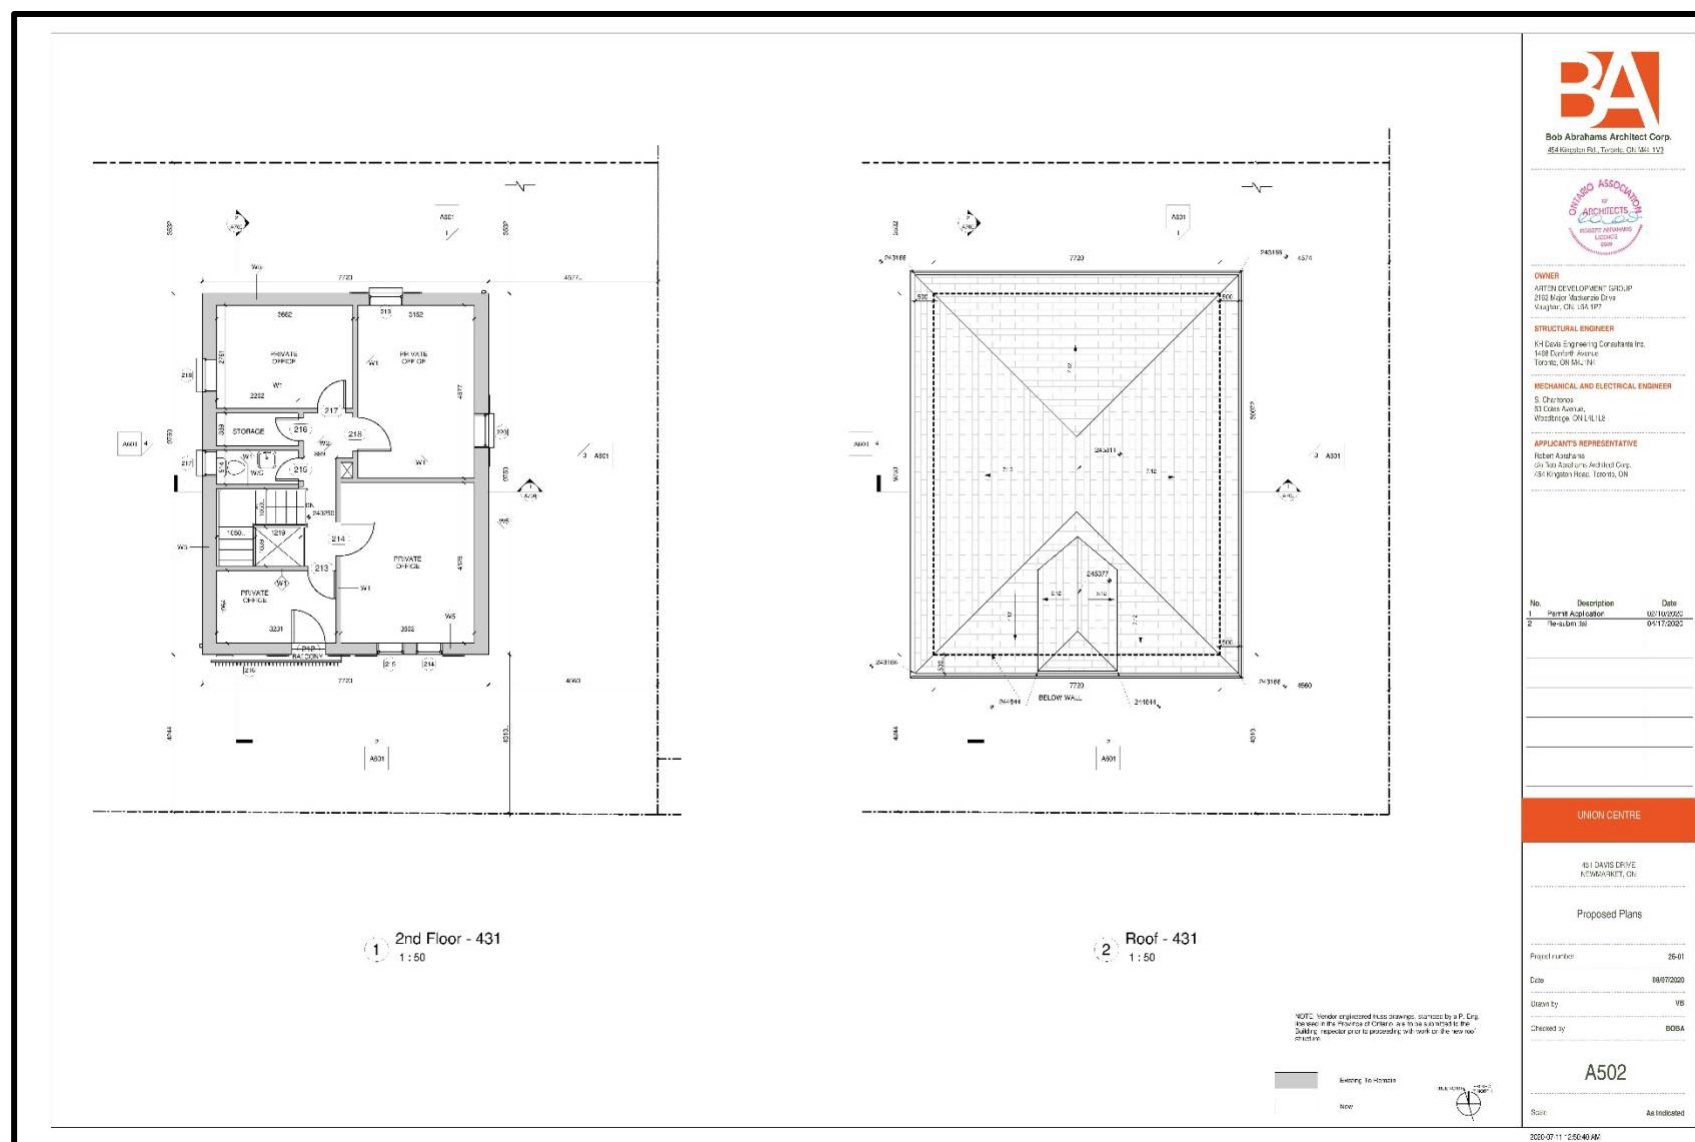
Proposed 2nd Floor and Roof Layout for 431 Davis Drive
